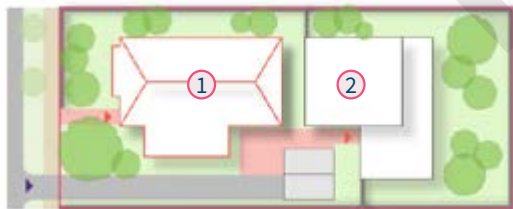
Detached dual occupancy where retaining the existing dwelling (in pink) with consolidated parking access from primary road. Buildings placed to allow for generous private open spaces.
